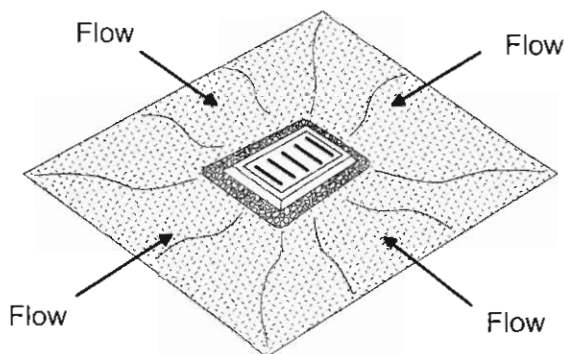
Perspective of Excavated Drop Inlet Protection
